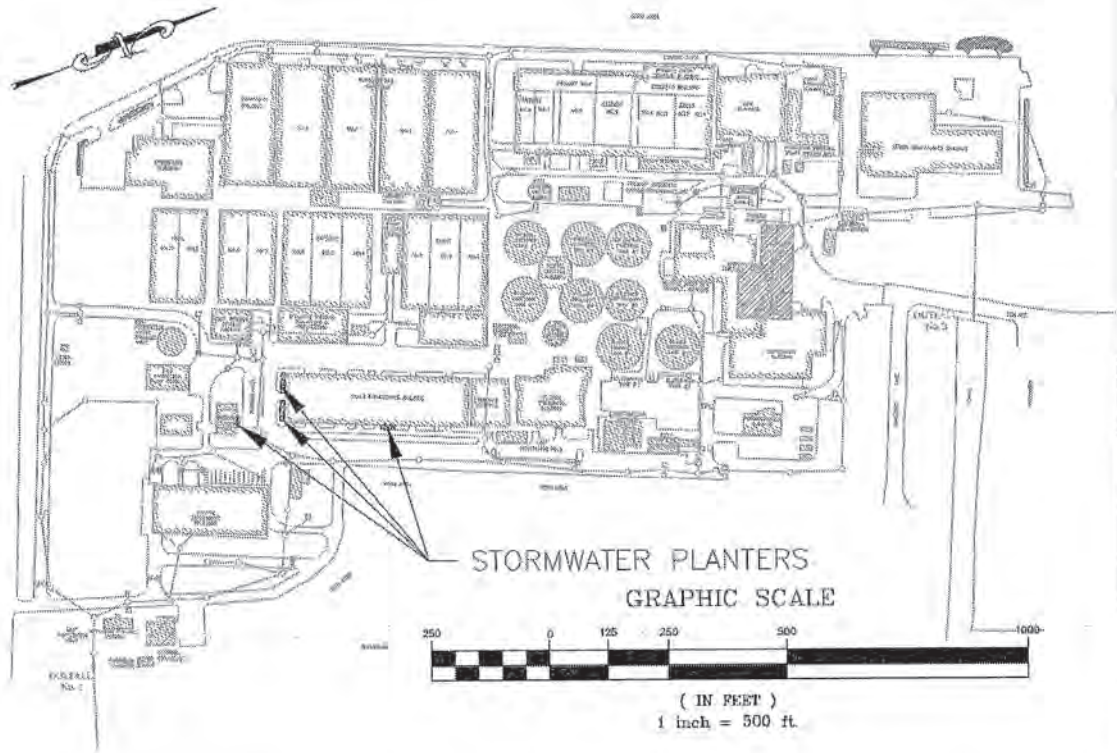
Bay Park WPCP Stormwater Planters Location Site Plan
